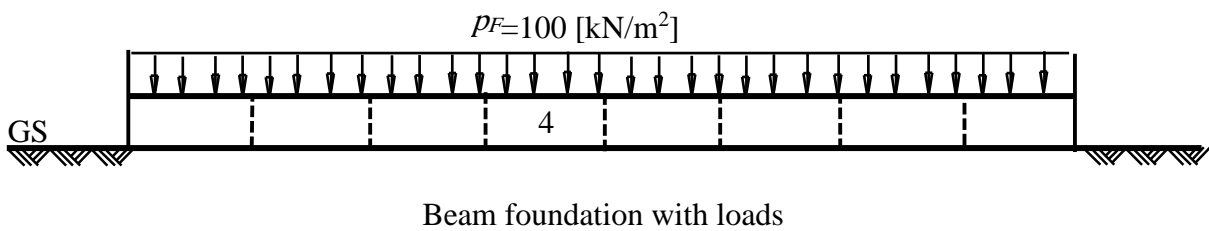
Beam foundation on an Isotropic Elastic Half Space Soil Medium
